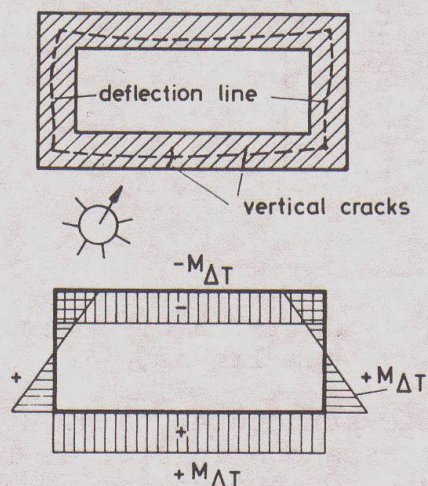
Bridge pier, M due to sunshine by restrained deformations
